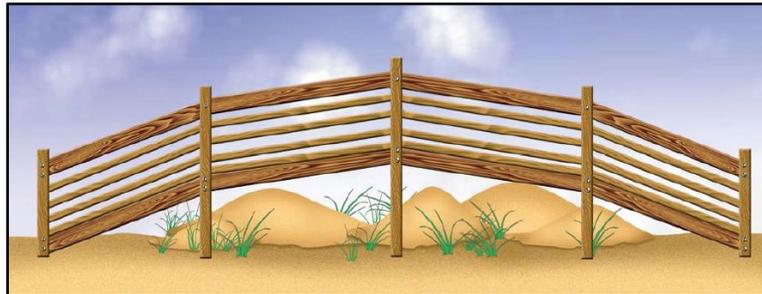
Pier-Supported Walkover with Ramps (GLO 2009)
